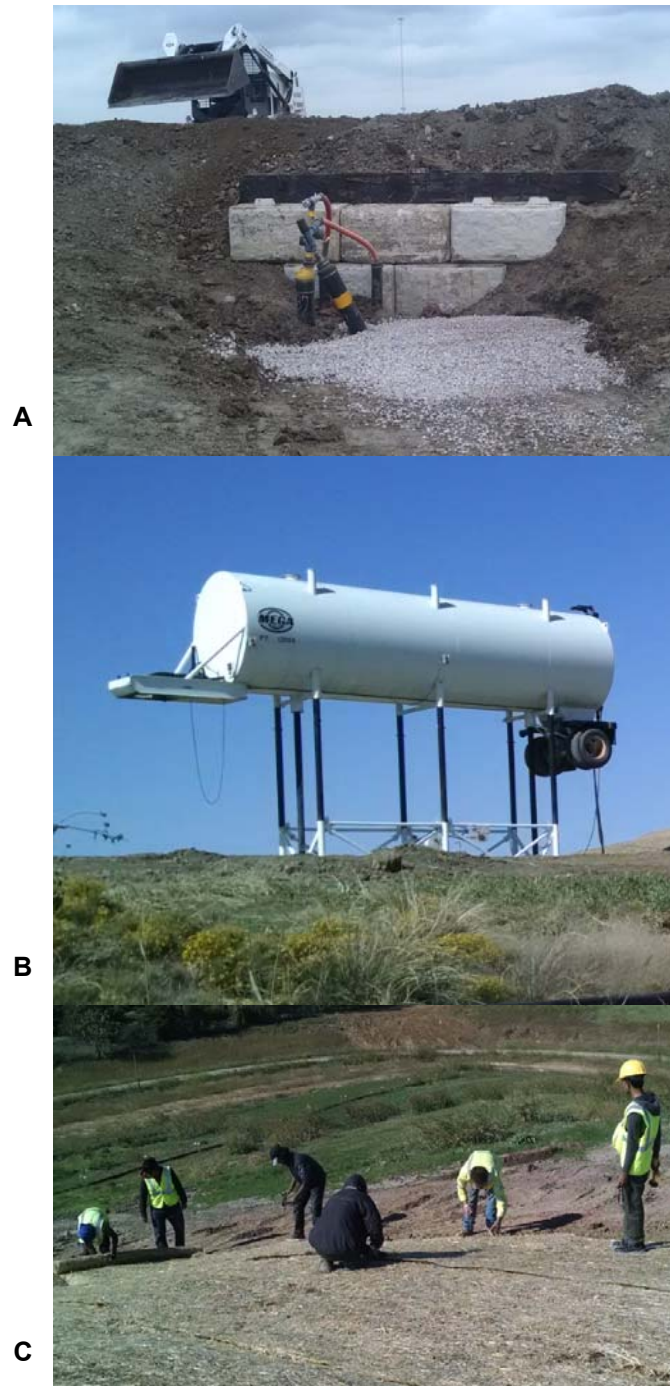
Clean-up activities a) gravity wall construction b) water tank placement c) erosion mat placement outside of lysimeters.
